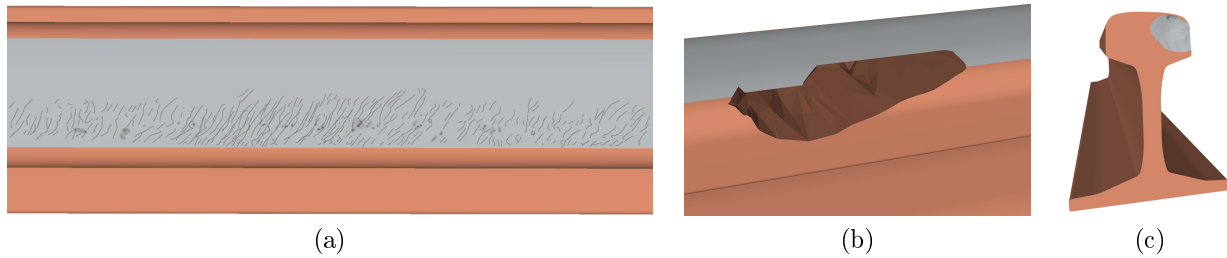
3D representation of RCF caused defects. (a) Gauge corner checking and spalls, which can cause (b) shelling or (c) transverse defects.
